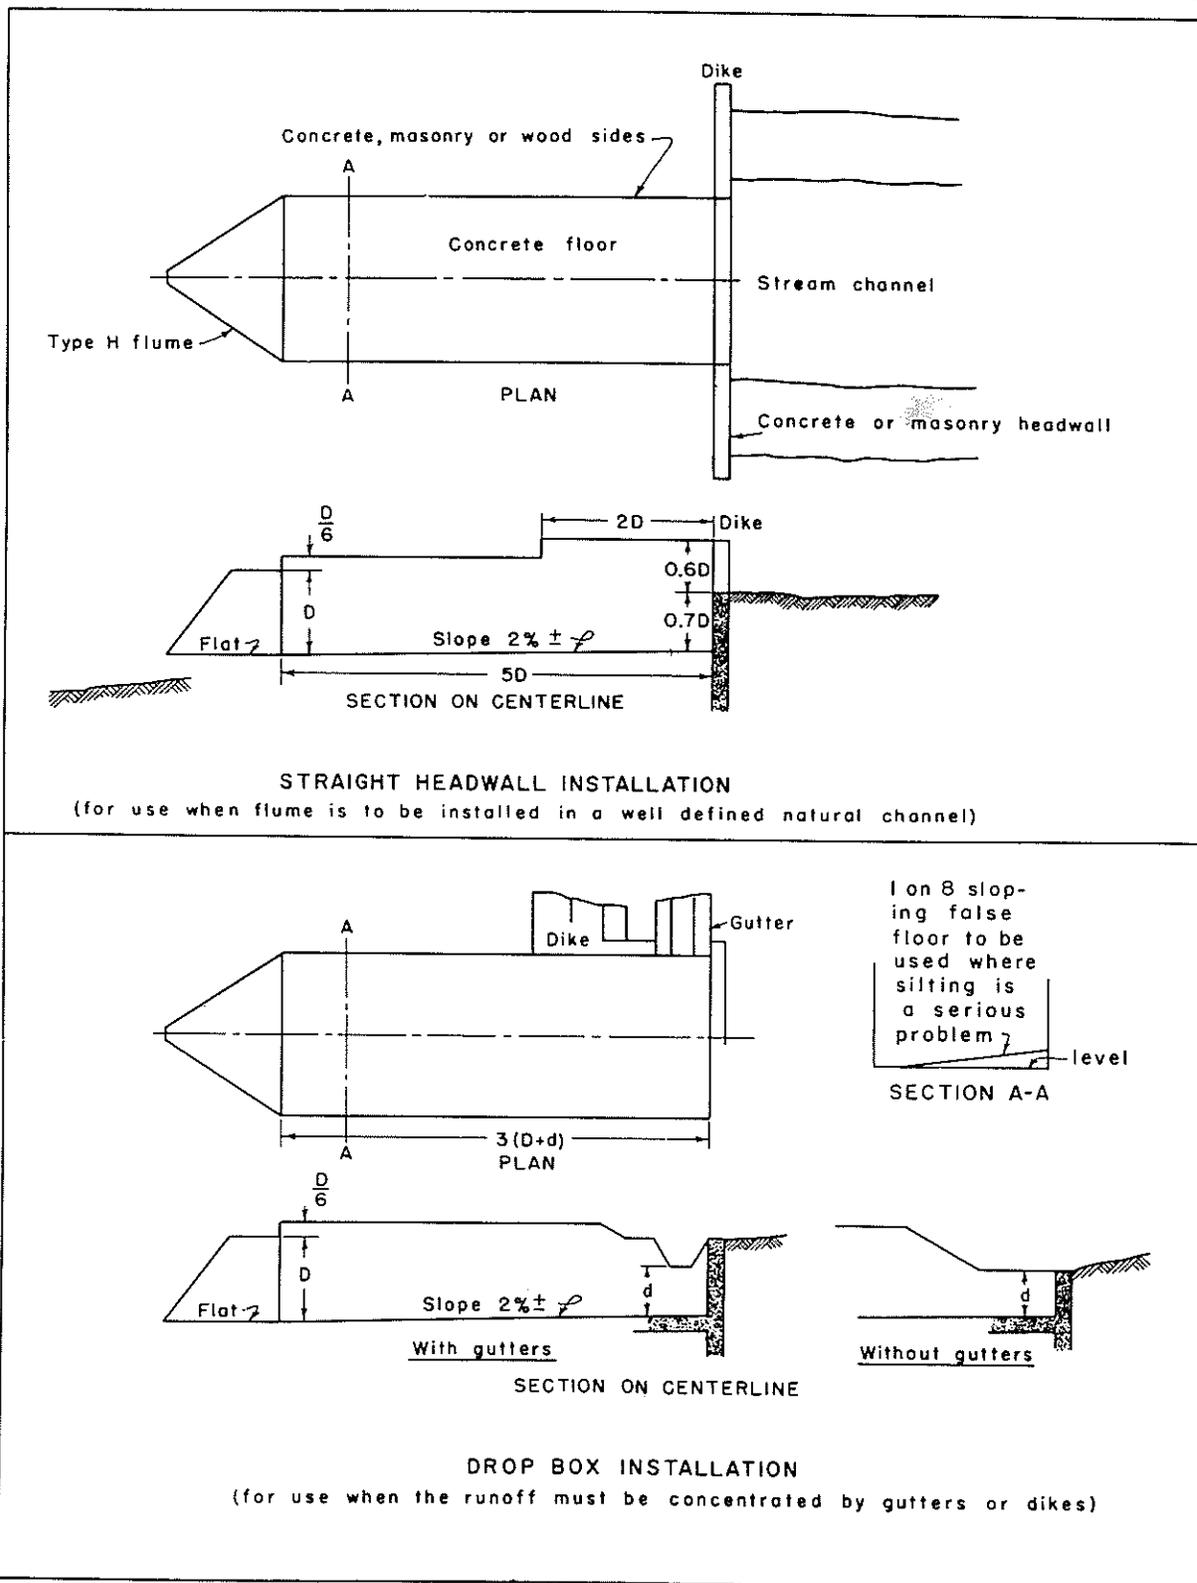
Plans for straight headwall and drop box installations of *HS*, *H*, or *HL* flumes.
